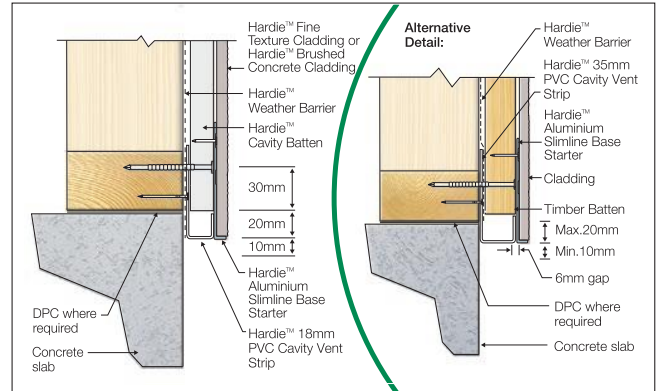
ALTERNATIVE SLAB EDGE DETAILS
